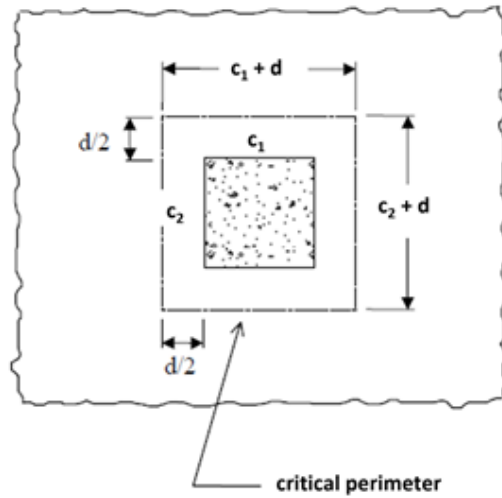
Critical Punching Perimeter of Interior Slab-Column Connection
